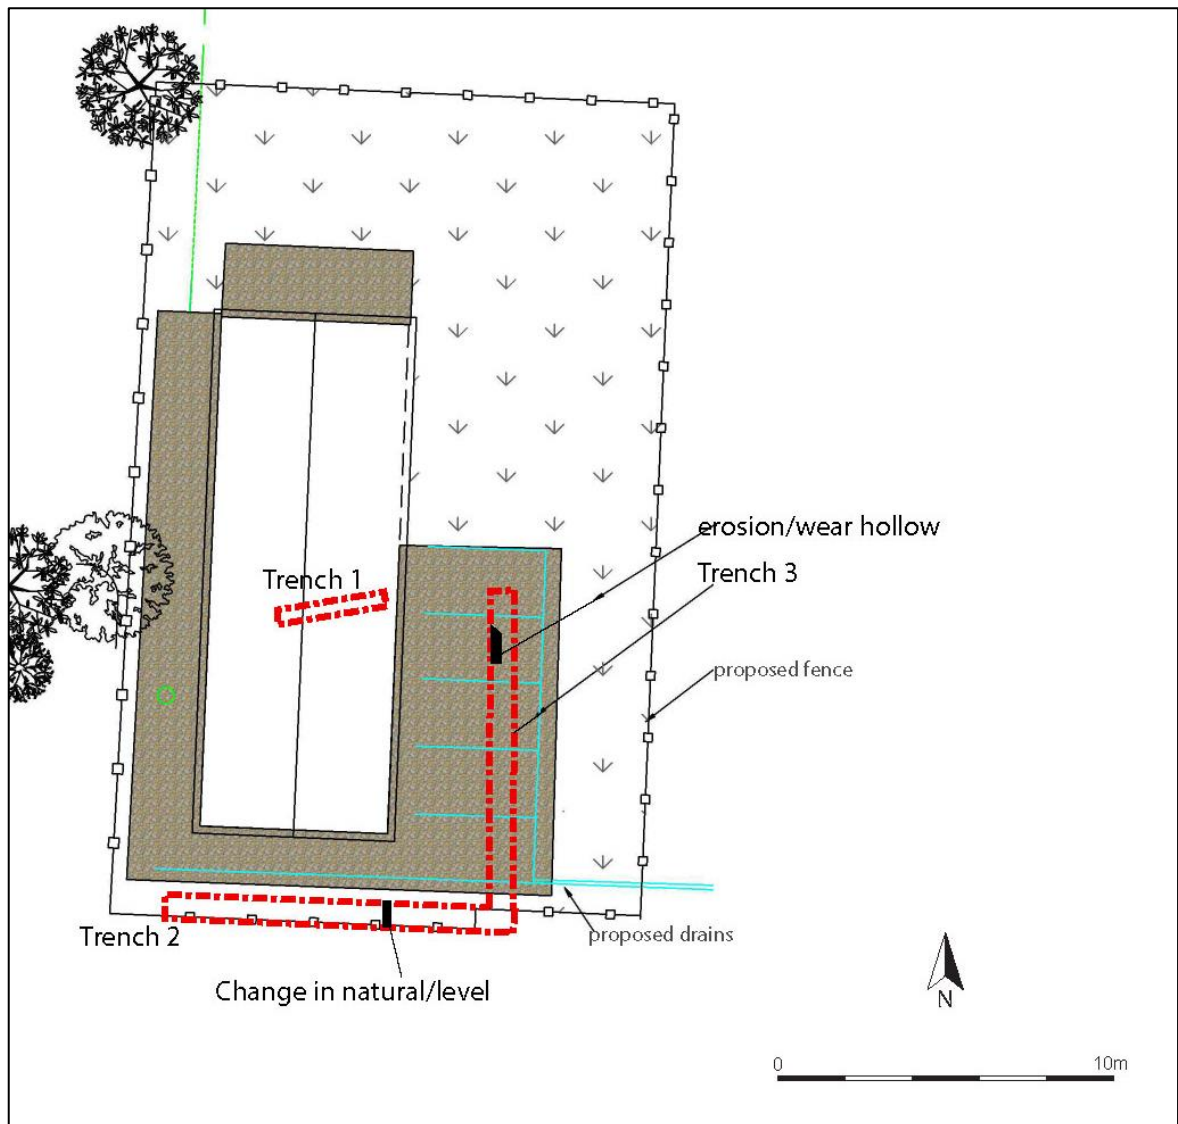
TRENCH PLAN OVERLAIN ON PROPOSAL PLAN (BASED ON ARCHITECTS DRAWING).
